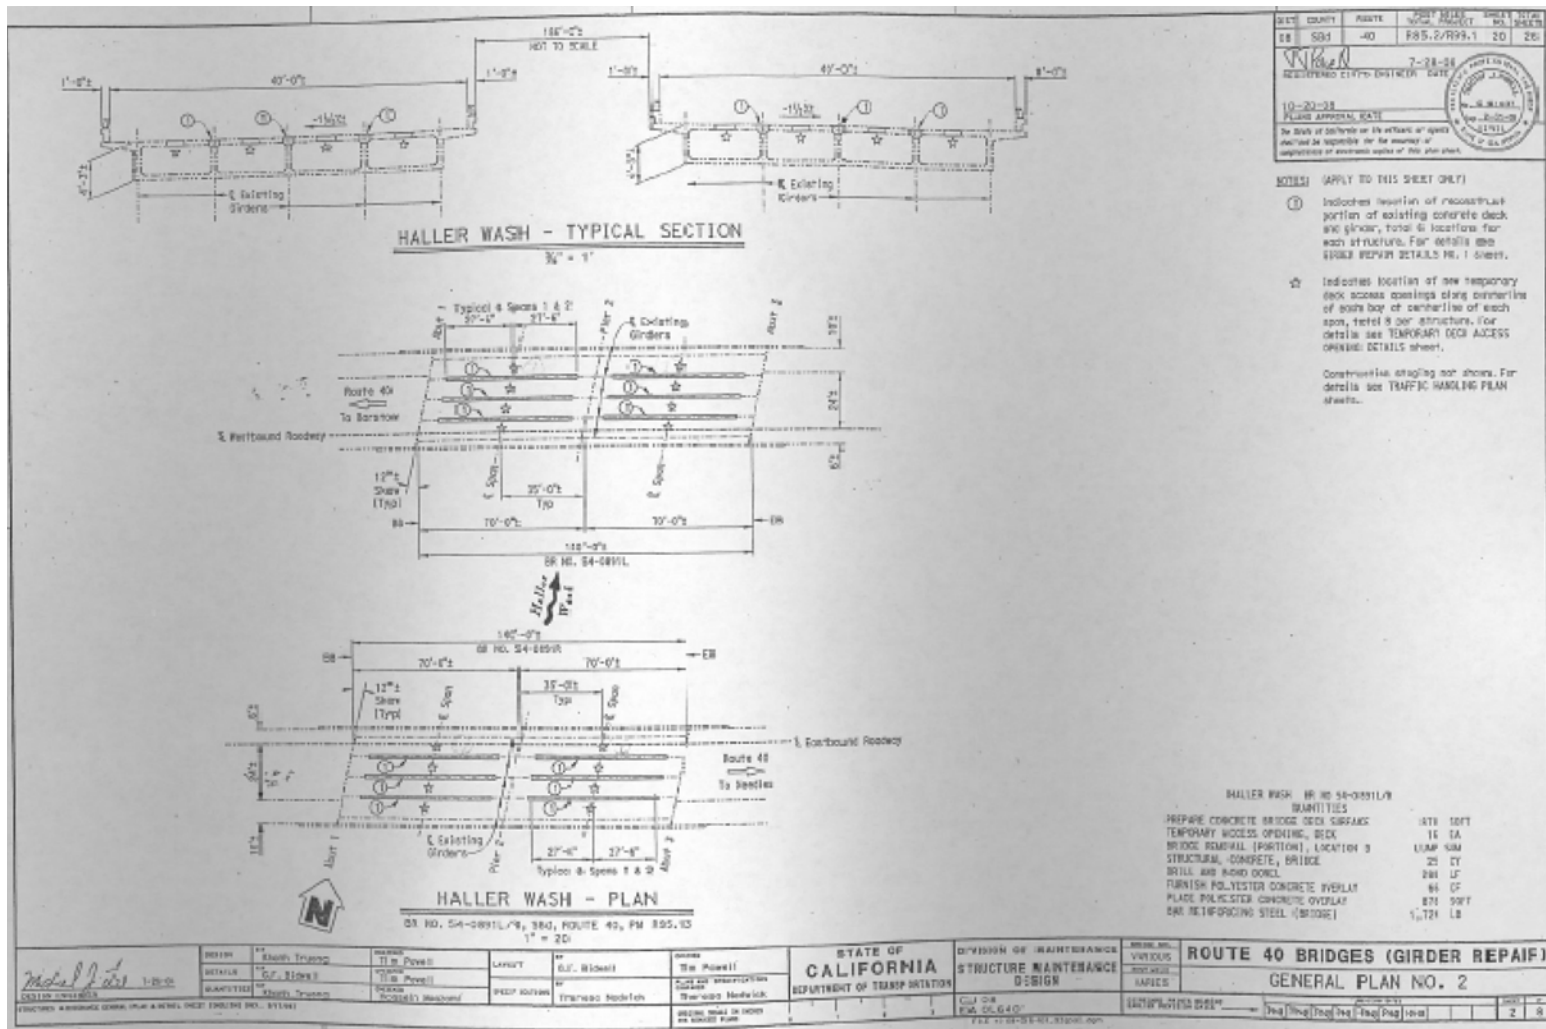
Typical section and plan for the Haller Wash Bridges (Rt. and Lt.).
